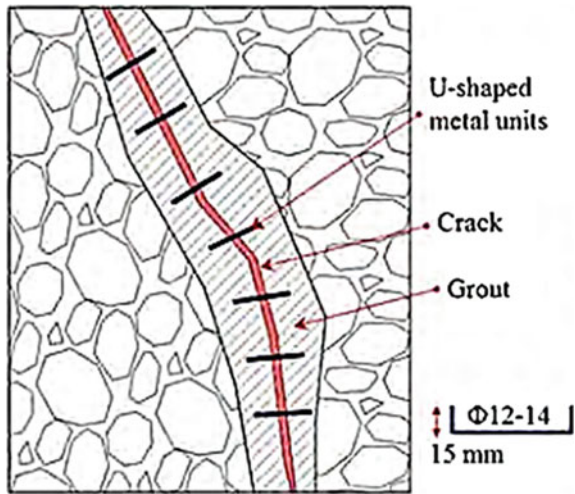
Detail of the grout injection method on a masonry wall [17]
